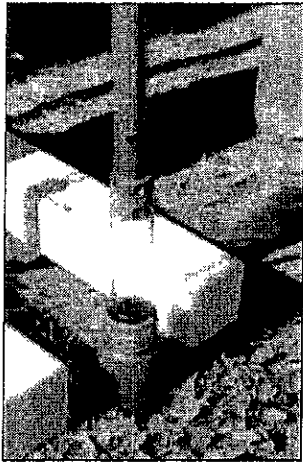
Lower liner to bottom of outer casing on leading end of inner rods.
